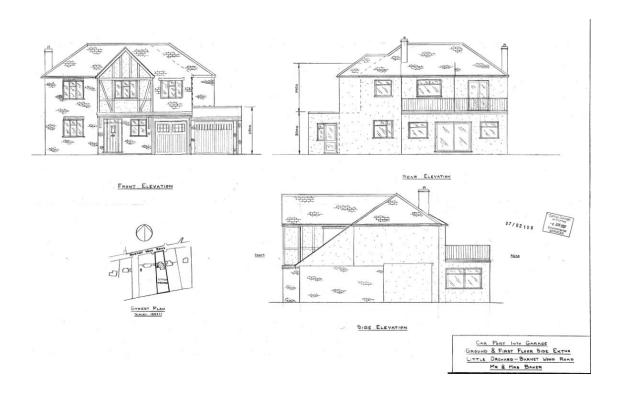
Floorplans of previously approved application (App Ref: 07/02106/FULL6)
